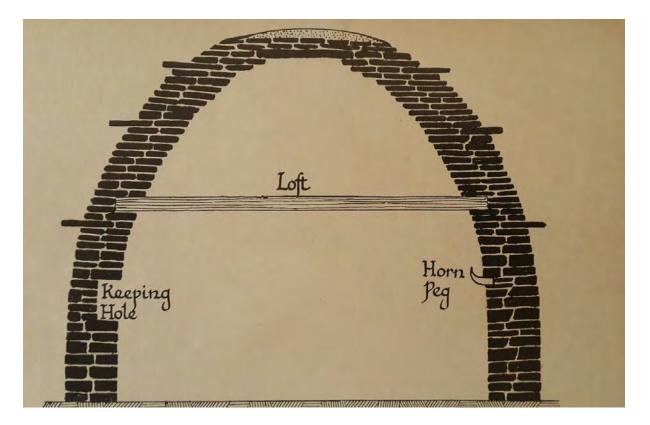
Section across a corbelled building at Schuinshoogte (Walton 1961)
